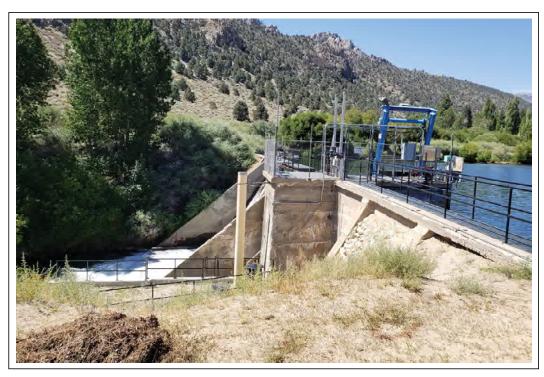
View of the dam and surrounding habitat at Powerhouse No. 3 and Intake No. 4.
